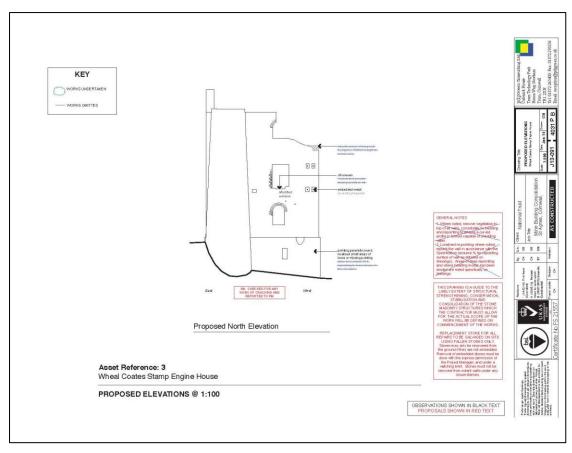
Northern external elevation of Wheal Coates stamps engine house.
